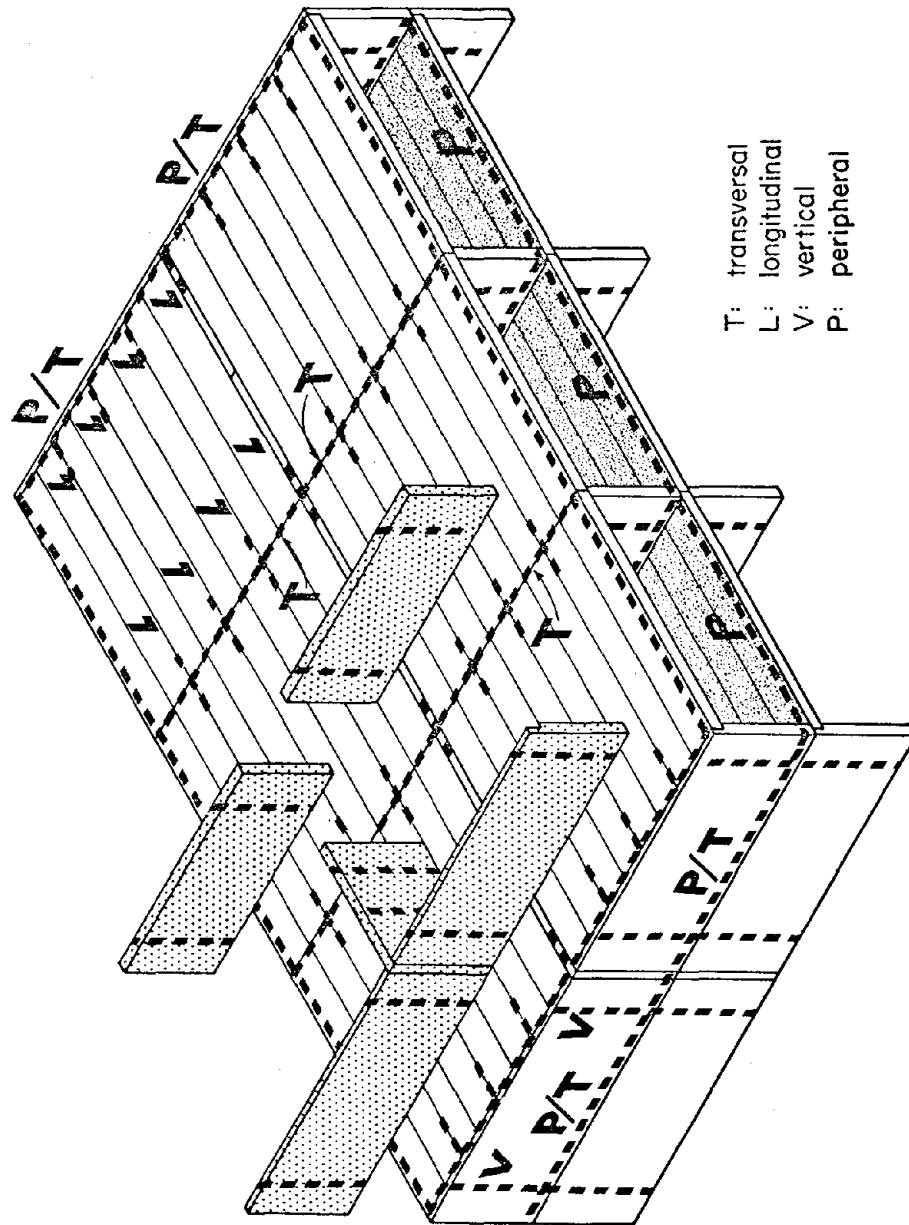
Suggested Systems of Tensile Tiers in Large Panel Structures
